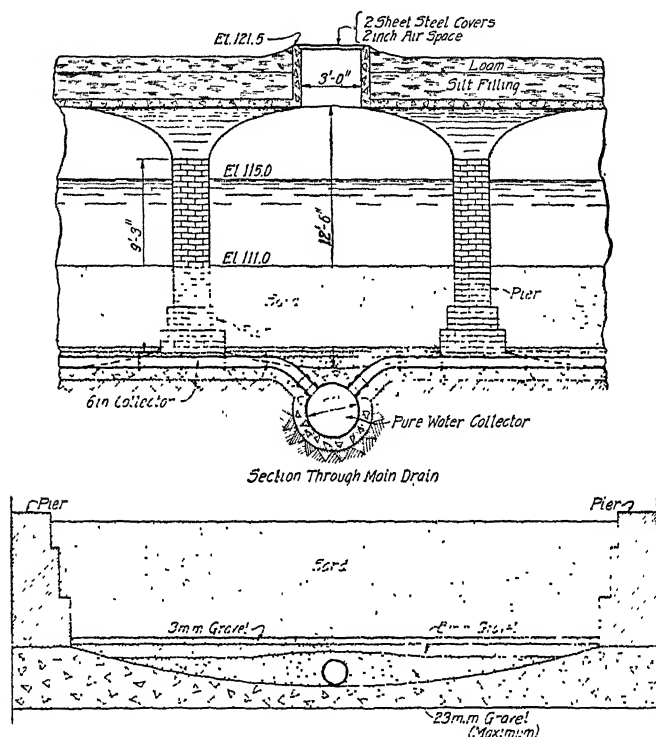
Sections Showing Details of Drains for the Albany, New York, Filter Beds
